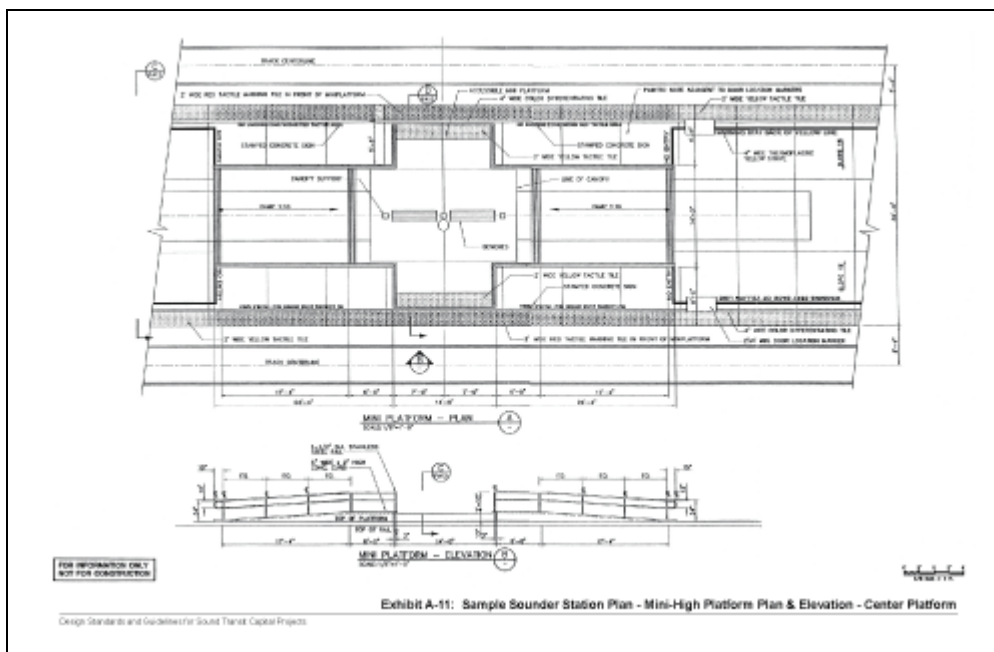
Sample Sounder Station Plans – Mini-High Platform Plan & Elevation – Center Platform (1.8 MB)
